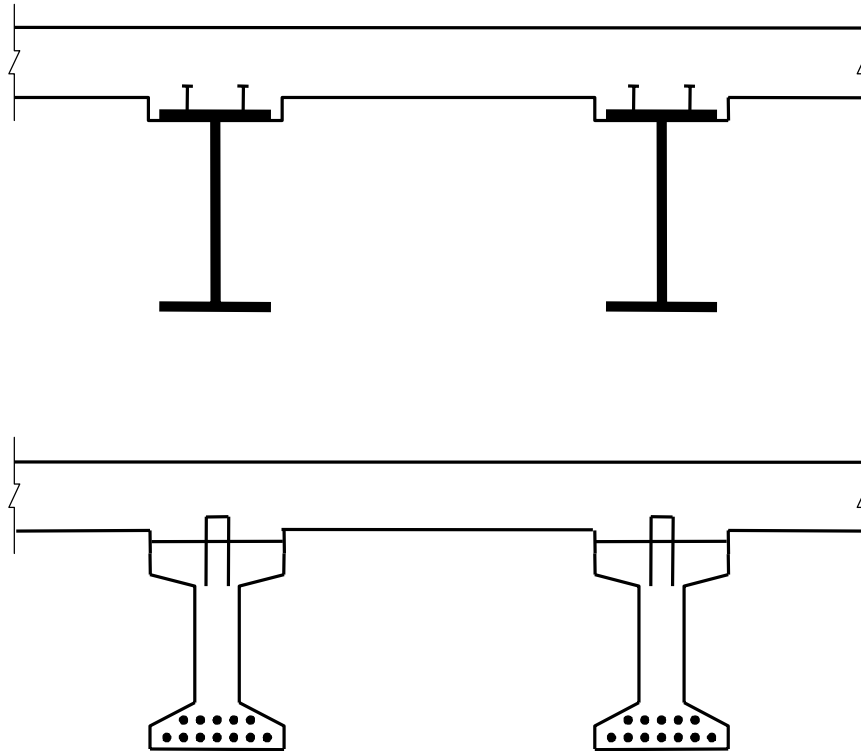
Composite Concrete Deck on Steel Beams and Prestressed Concrete Beams
